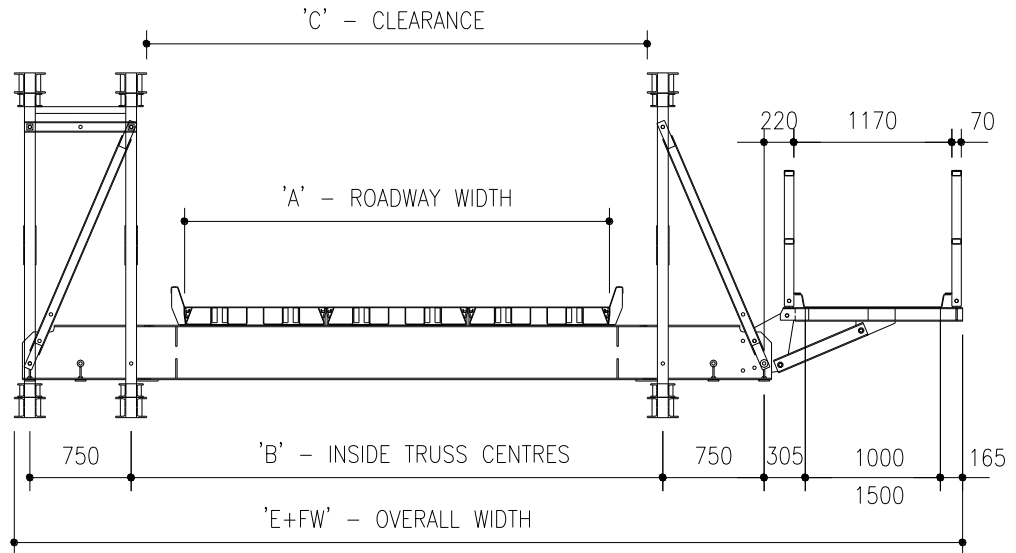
TYPICAL CROSS SECTIONS OF SINGLE STOREY BRIDGES WITH FOOTWALK
